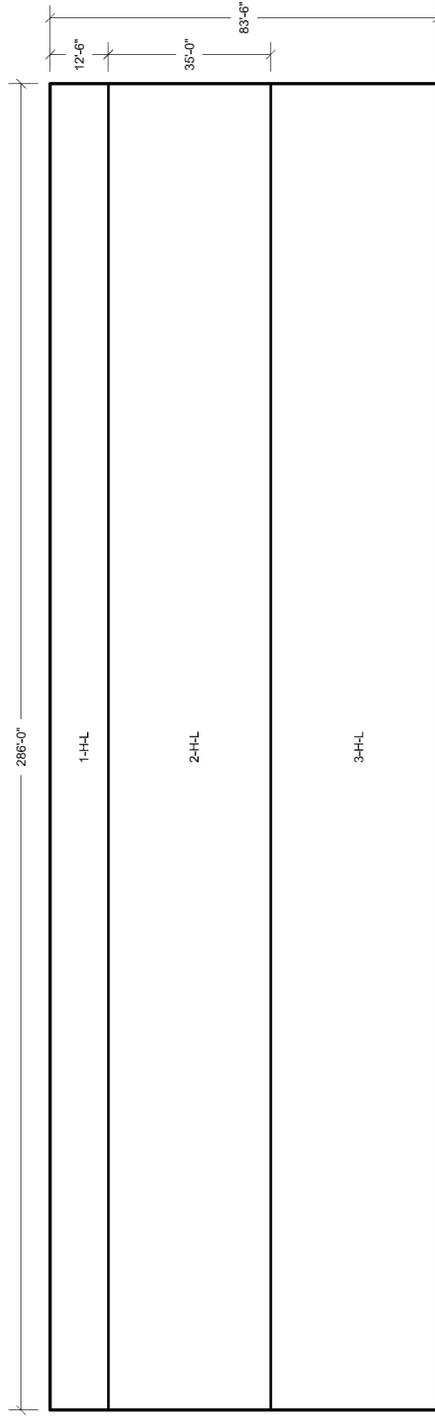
H.6-87: UHS BASIN SOUTH WALL LOOKING NORTH
